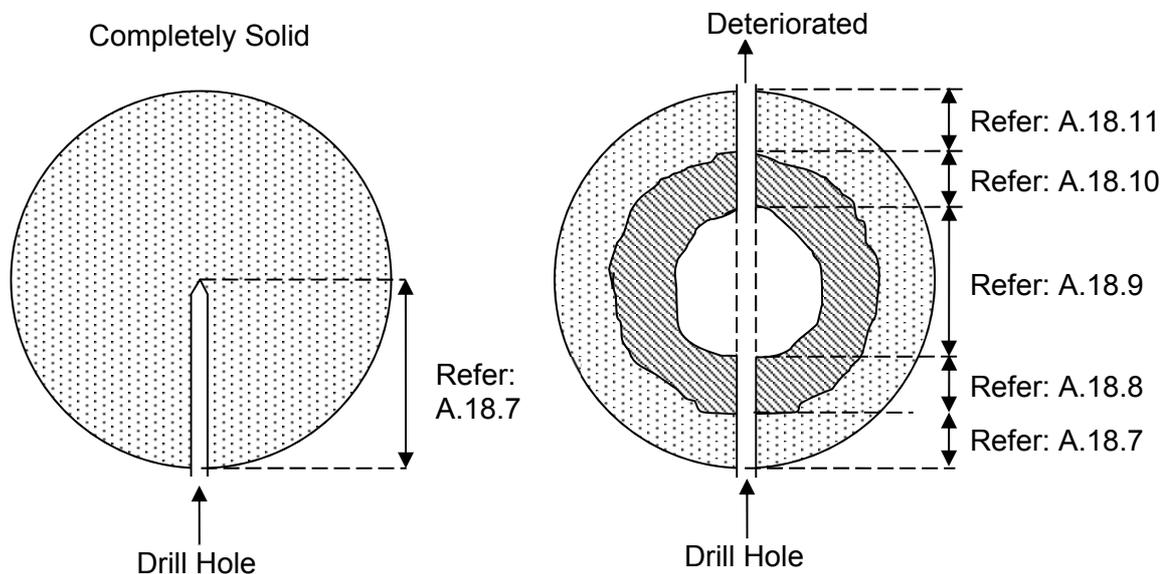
STRINGER DRILLING MEASUREMENTS
